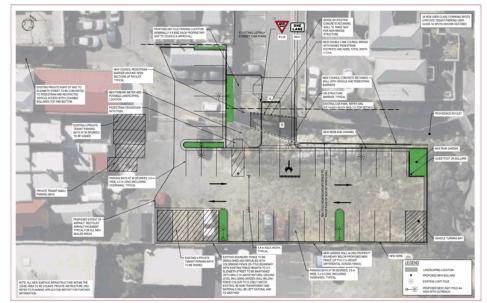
Layout of the proposed car parking area behind 325 and 321-323A Elizabeth Street
